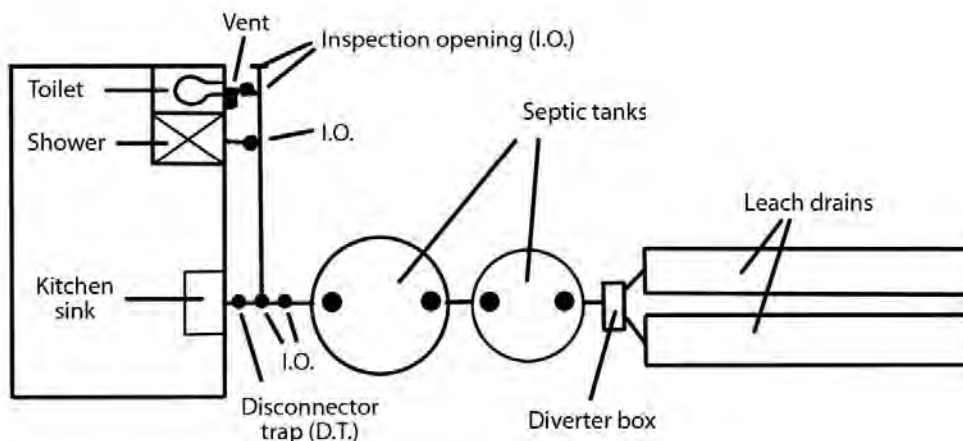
Plan view (top) of an on-site sewage disposal system.
